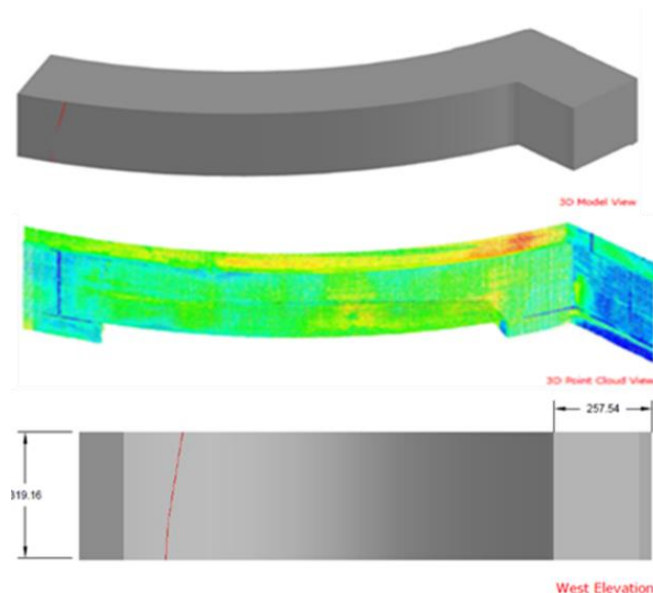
Top/Middle: 3D Revit model and 3D Point Cloud Data; Bottom; 2D CAD drawings showing position of crack
